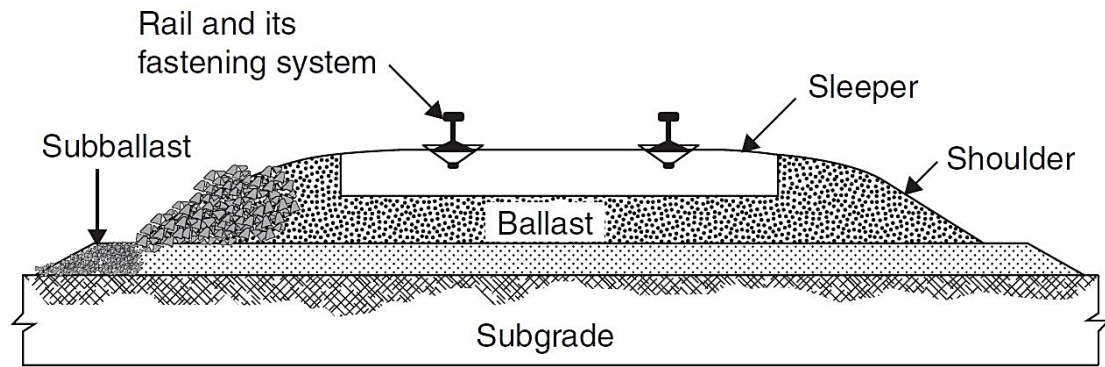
Typical railway track structures, from Indraratna (2011)
